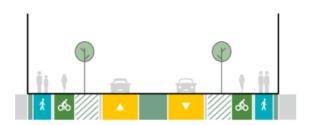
CFAF Outcome - Upgrade to Wainui Road indicative 24 m cross section
